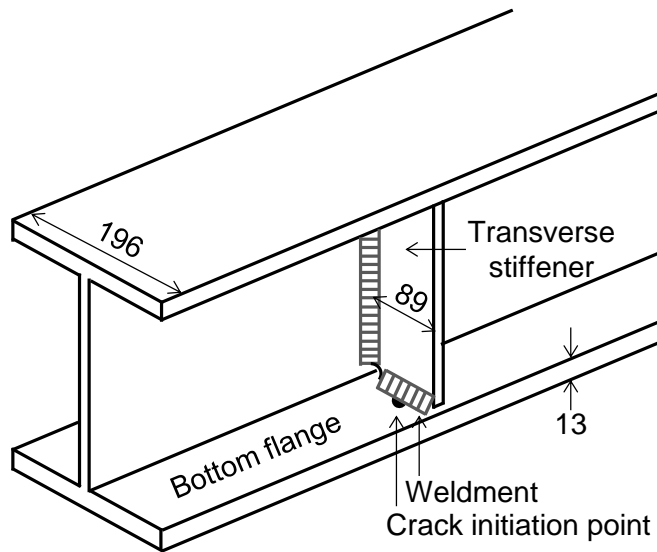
Transverse stiffener detail (Fisher et al., 1974) (unit: mm)
